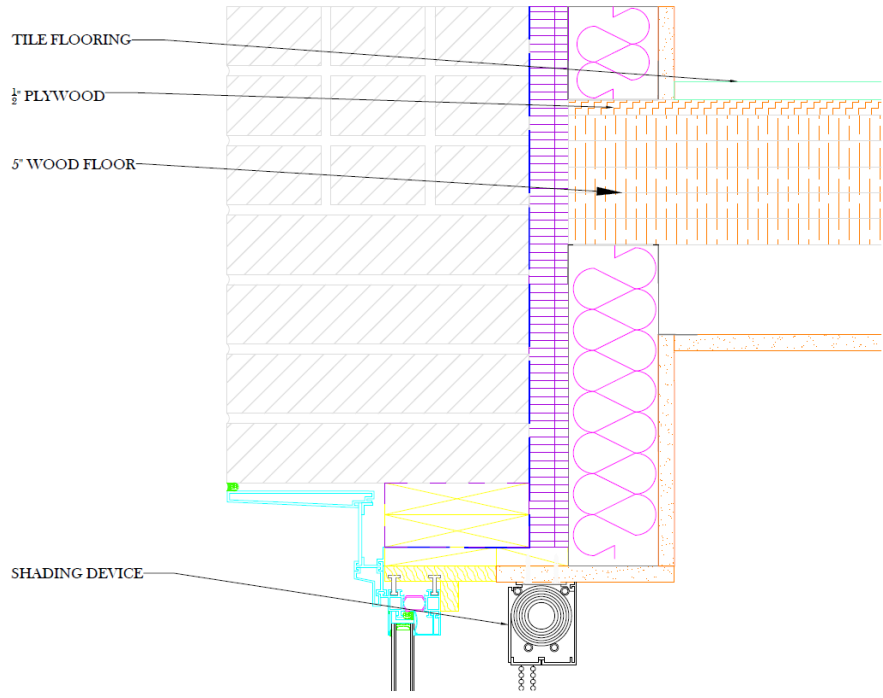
Stratton Hall Schematic Drawing 3-Upper Window Section
